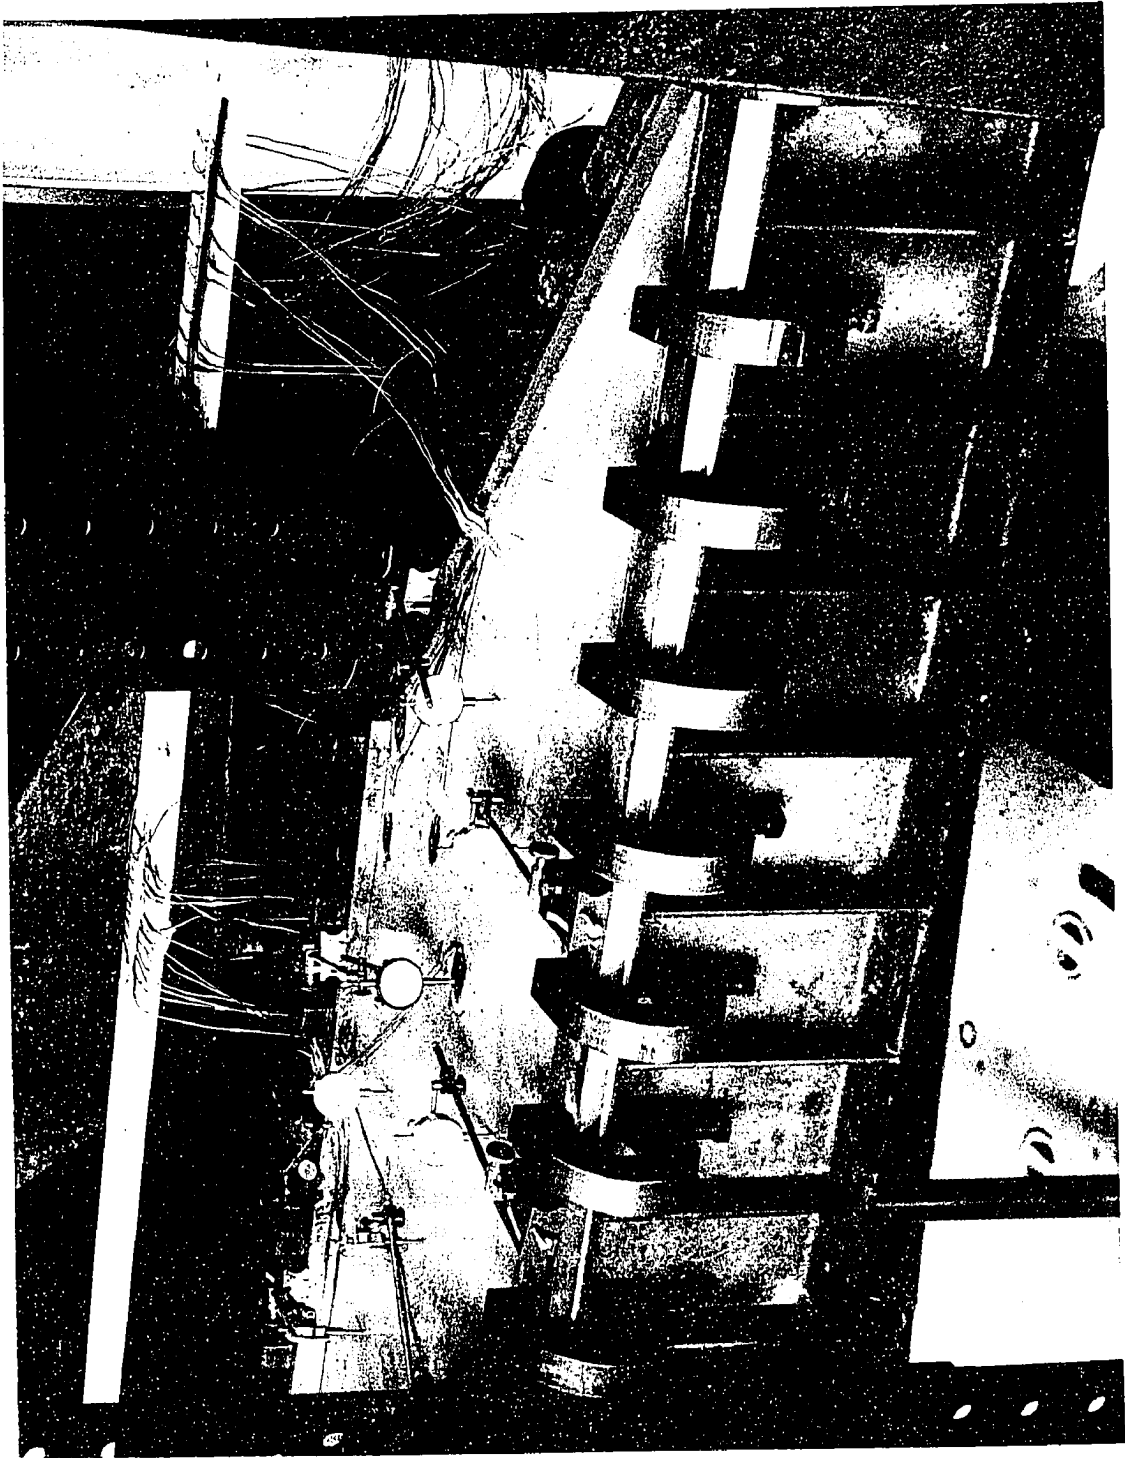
PHOTOGRAPH SHOWING SUPPORTING CHANNELS AND CLAMPED EDGES
